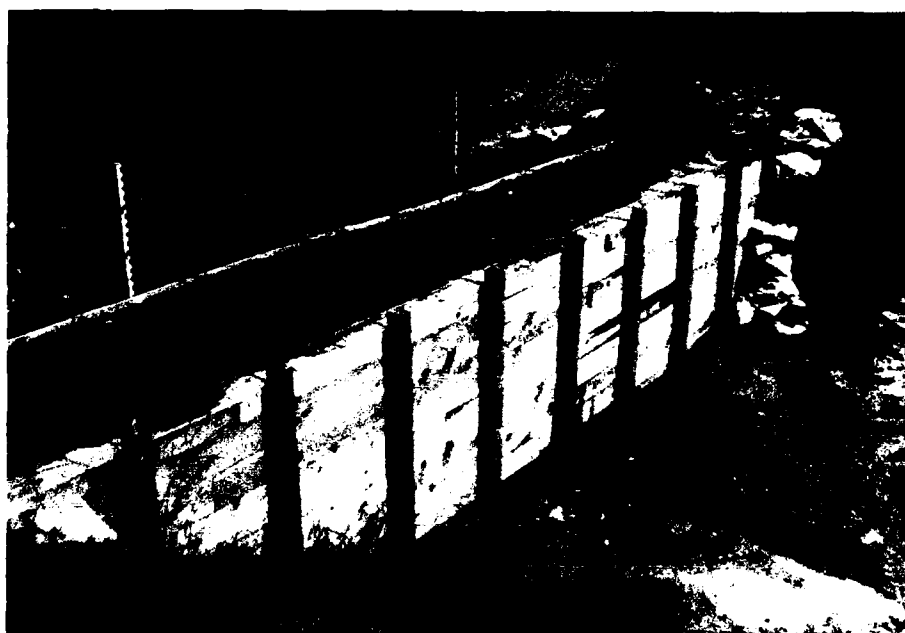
Landside view of Section 6-2 at the end of the static differential head tests
